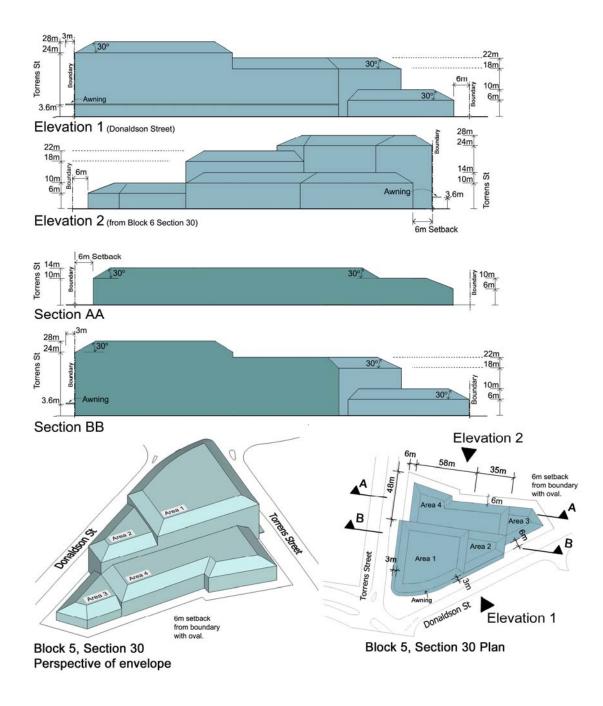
Building Envelope Diagram - Braddon Section 30 (CZ3 Zone)
